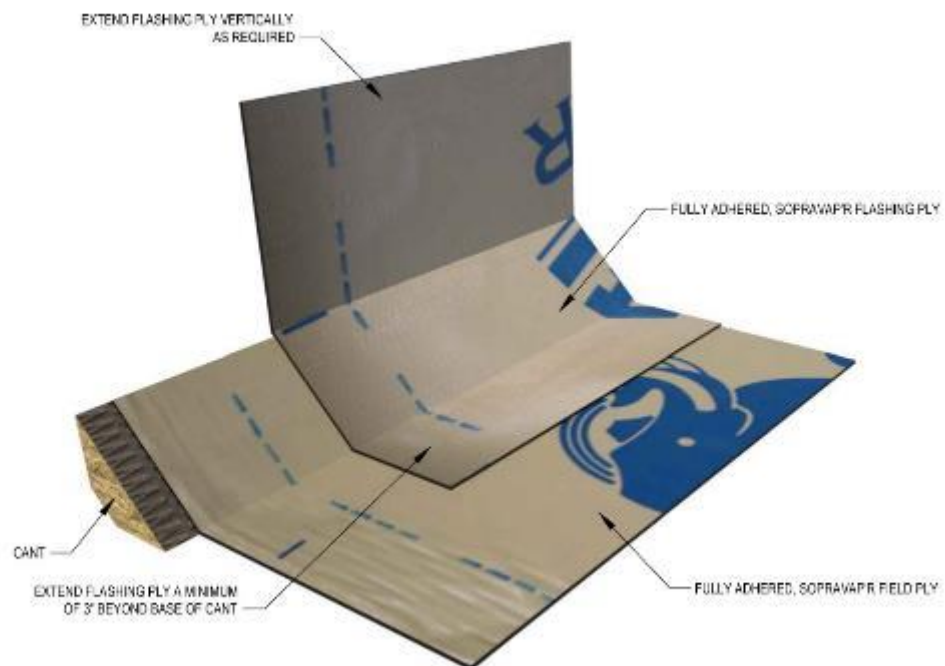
Fully Adhered, Self-Adhesive SOPRAVAP'R Flashing at Wall/Curb With Cant
